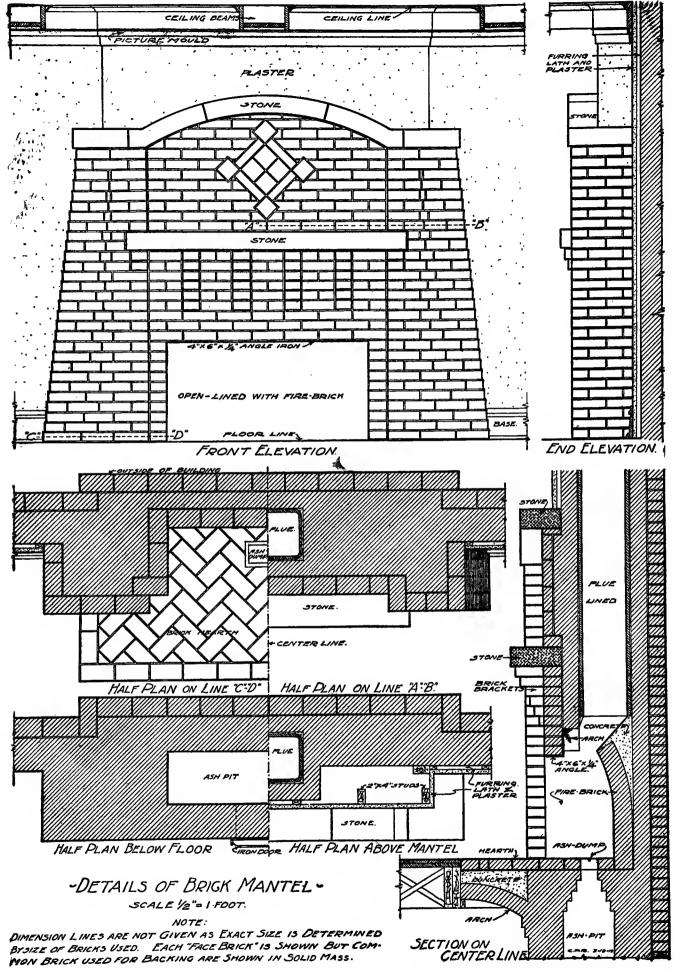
BRICK MANTEL DESIGN AND FIRE PLACE CONSTRUCTION
